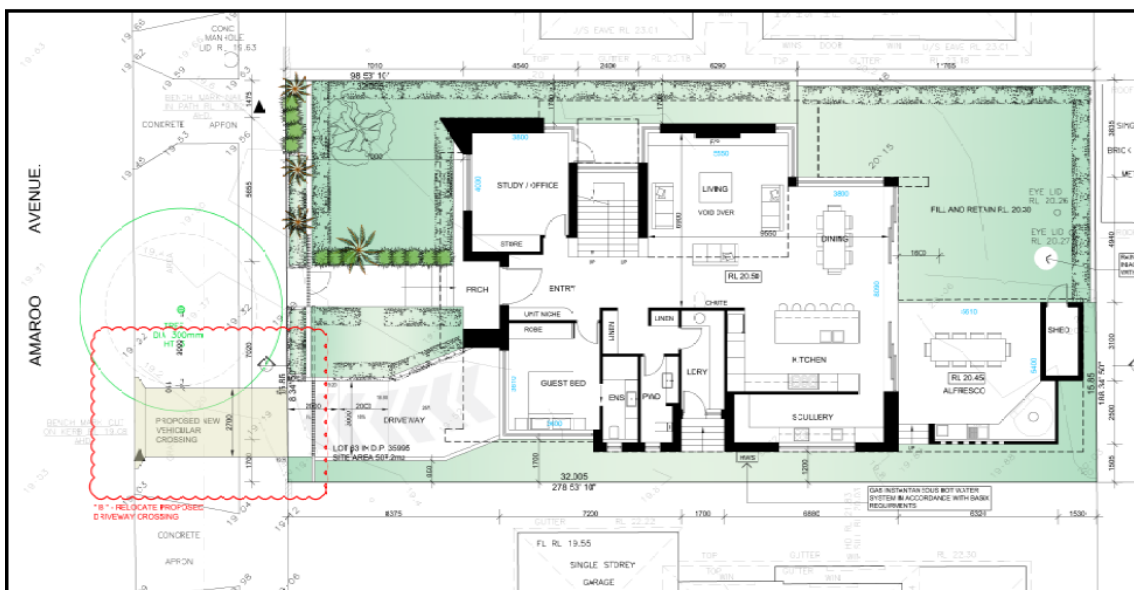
Ground floor plan 1364 - 01 Rev. B (IDAP assessed 29 April 2022)
